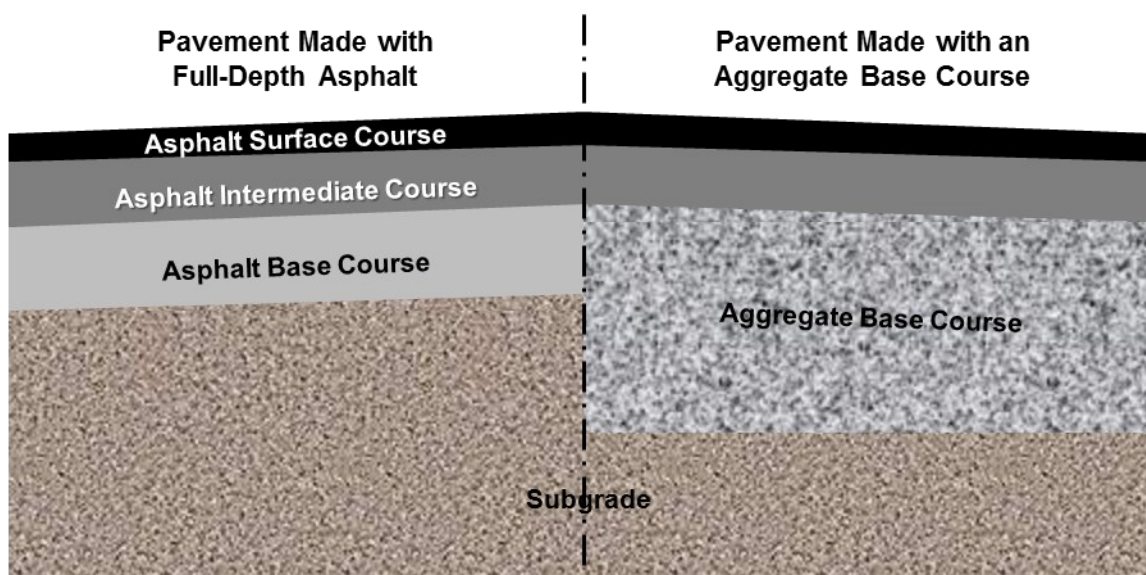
Typical cross-sections for full-depth asphalt pavements (on left) and asphalt pavements designed with an aggregate (or Macadam) base course (on right) (not to scale).
